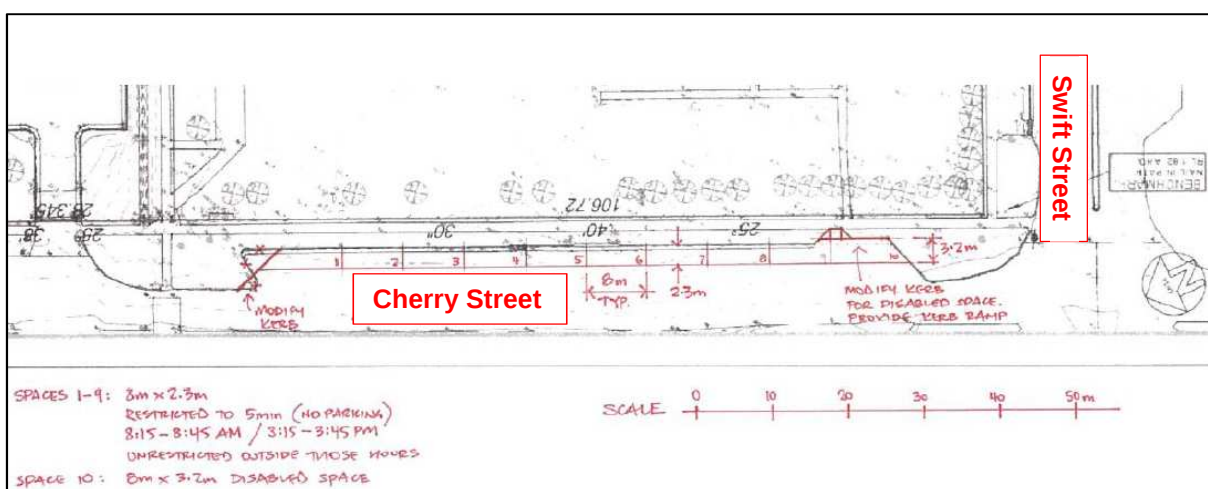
Location of the student drop-off and pick-up area along Cherry Street (Source: Applicant's RtS)
